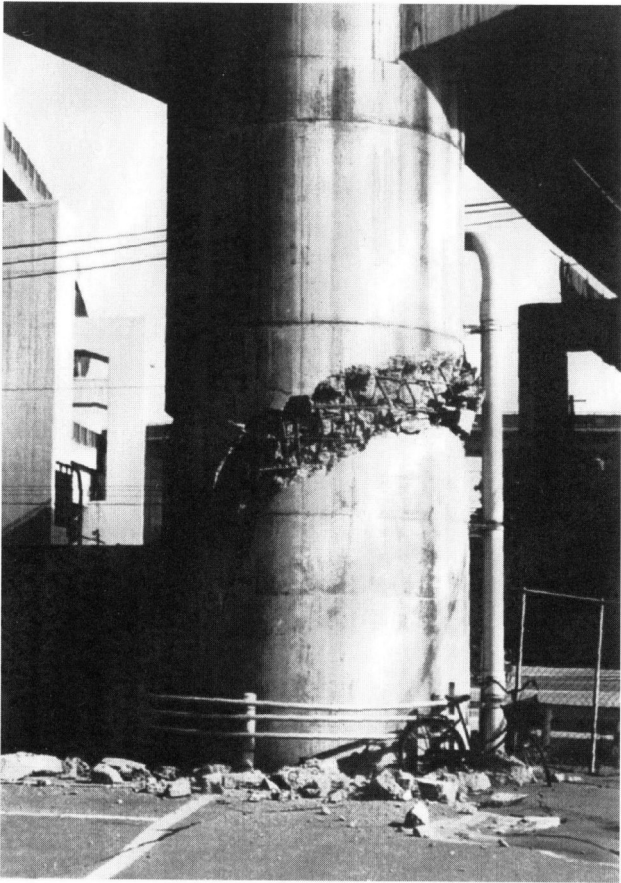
Damaged bridge column at rebar cut-off section.
